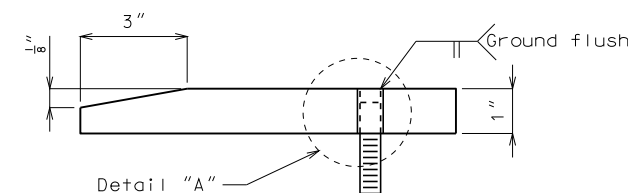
DETAILS OF MODIFIED FINGER PLATE EXPANSION DEVICE AT PIERS NO. 3, 5 & 7
